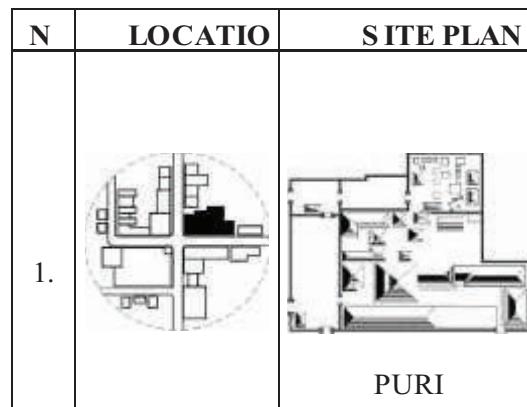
Location and Site Plan of Puri Agung Pemecutan Denpasar
